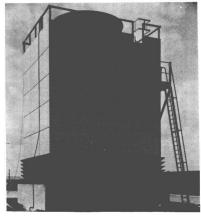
Induced draught tower with glazed asbestos casing.
